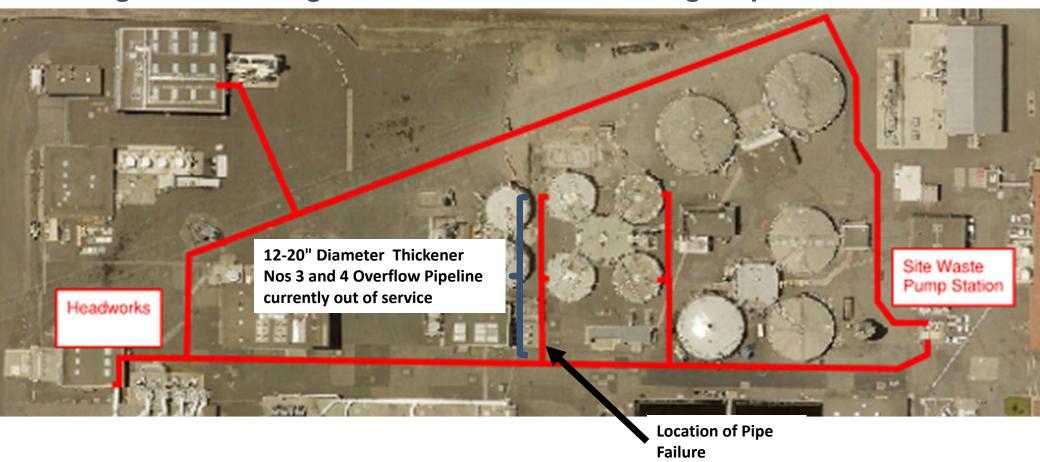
Existing Pressurized On-site Drainage Pipeline Failure
